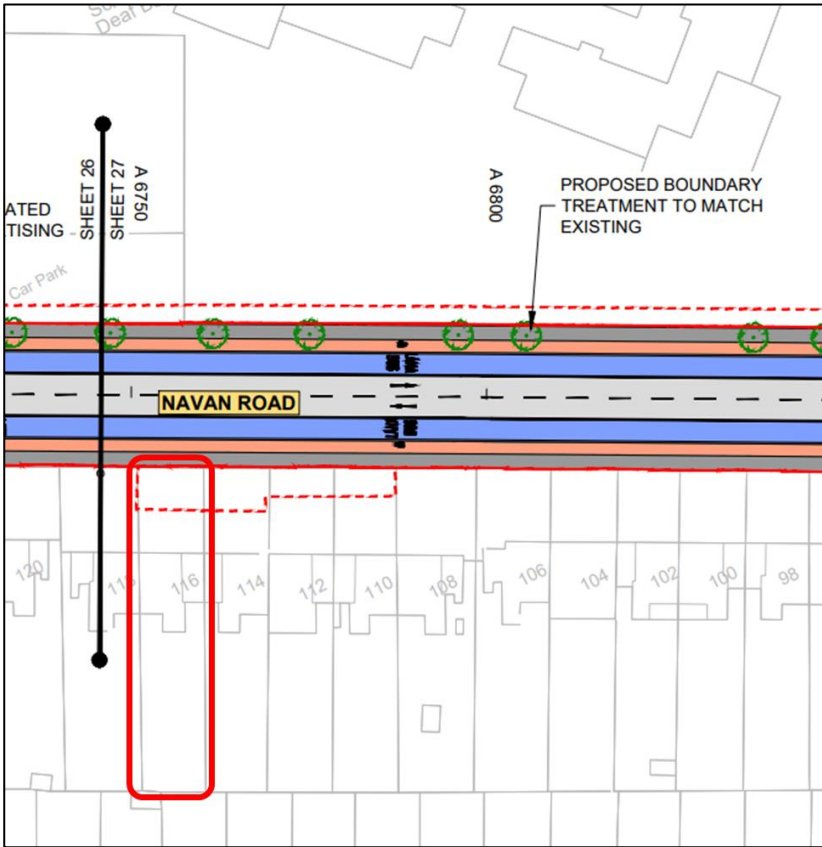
Proposed new Layout at 116 Navan Road
